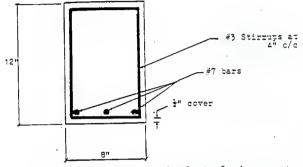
An Arbitrary Section with Reinforcing Bar Arrangement Near Mid-span for Under-reinforced Specimen (UR1) (1 in. = 25.4 mm)
